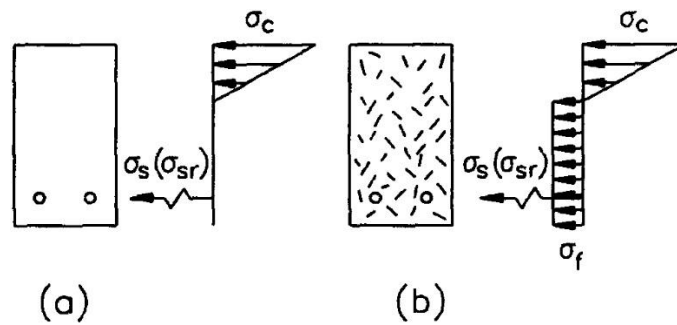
Distribution of stress in cracked section. (Vandewalle, 2000)
